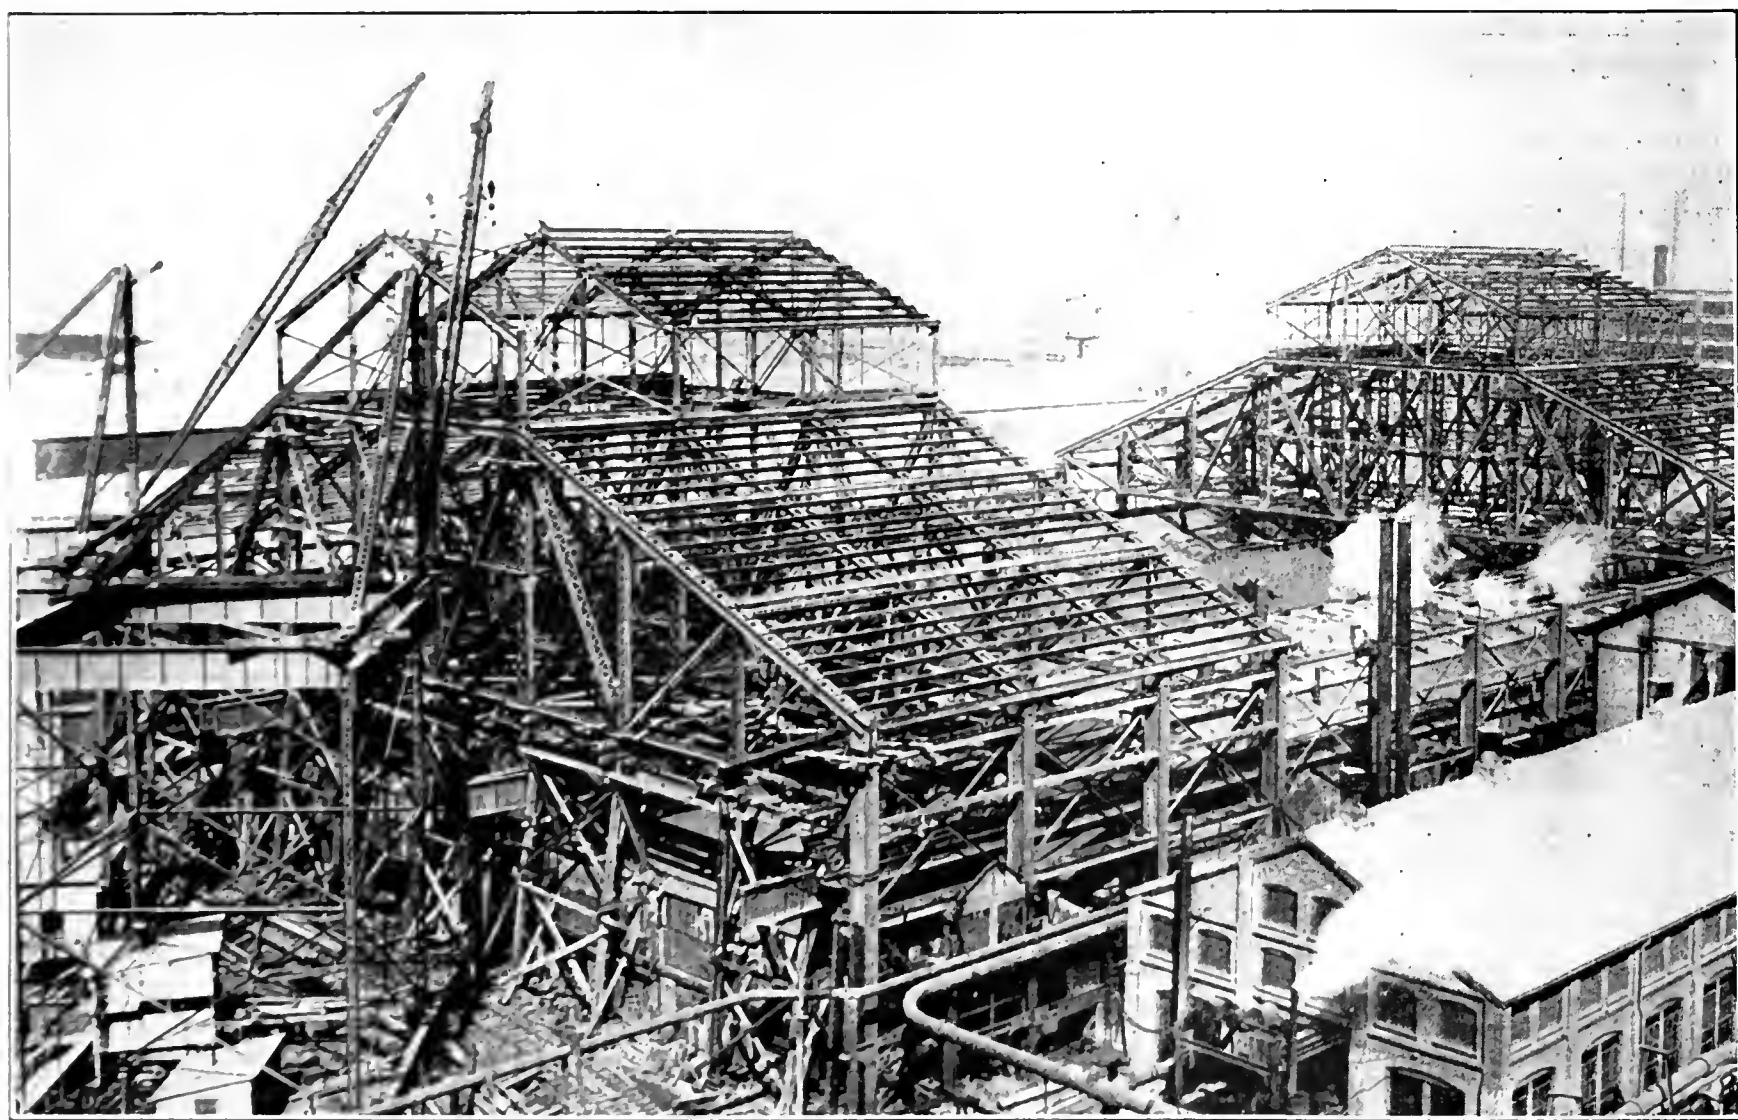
SECOND GROUP OF FOUR TRUSSES OF CRUCIBLE STEEL COMPANY ROLLING MILL READY TO BE ROLLED TO PLACE—VIEW FROM SOUTHEAST
